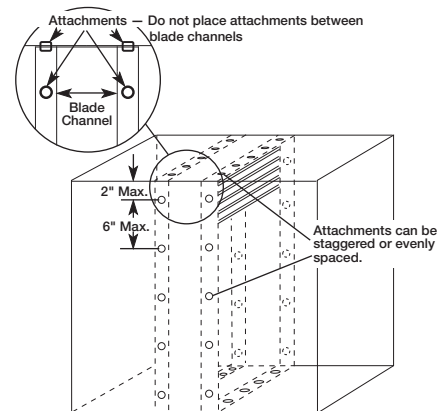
Field Attachment of Fire Dampers to Sleeves
